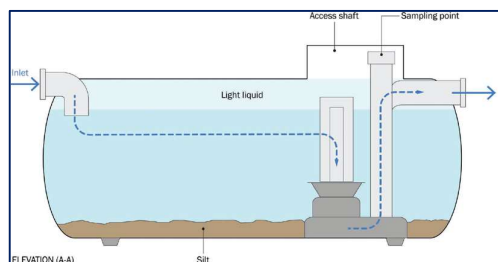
Typical Section Detail of Fuel Separator (CIRIA C753)
